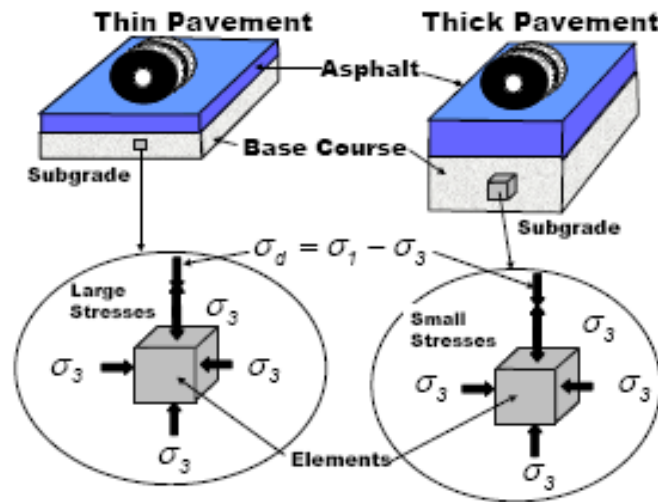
Stress level in a pavement (Hopkins et al. 2007)
